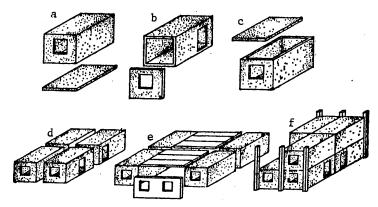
Types of three-dimensional monolithic modules and their structural systems. Monolithic module: a--"cap"; b--"sleeve"; c--"recumbent sleeve"; structural system: d--block; e--block-panel; f--block-frame.
